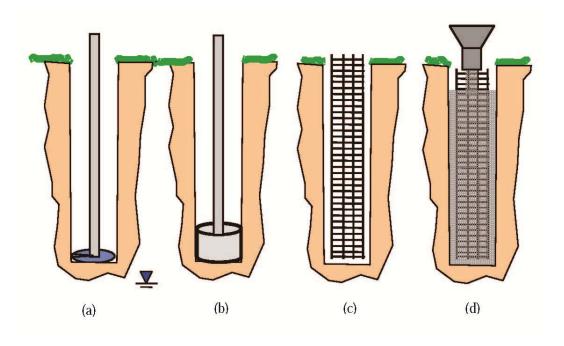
Drilled shaft installation (a) Drill hole (b) Clean bearing surface (c) Install reinforcing steel (d) Place concrete (Brown et al. 2010)
